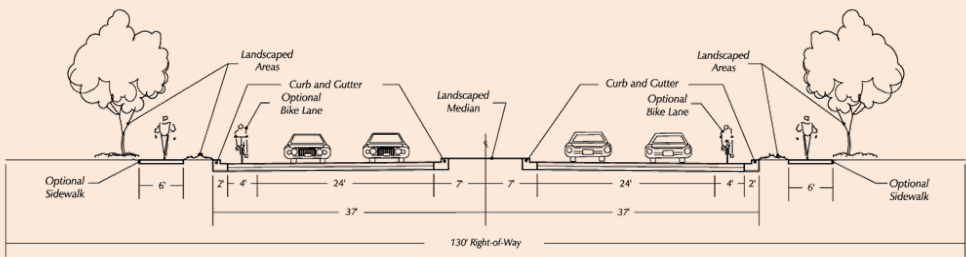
Typical Minor Arterial Cross-Section (With Median)
